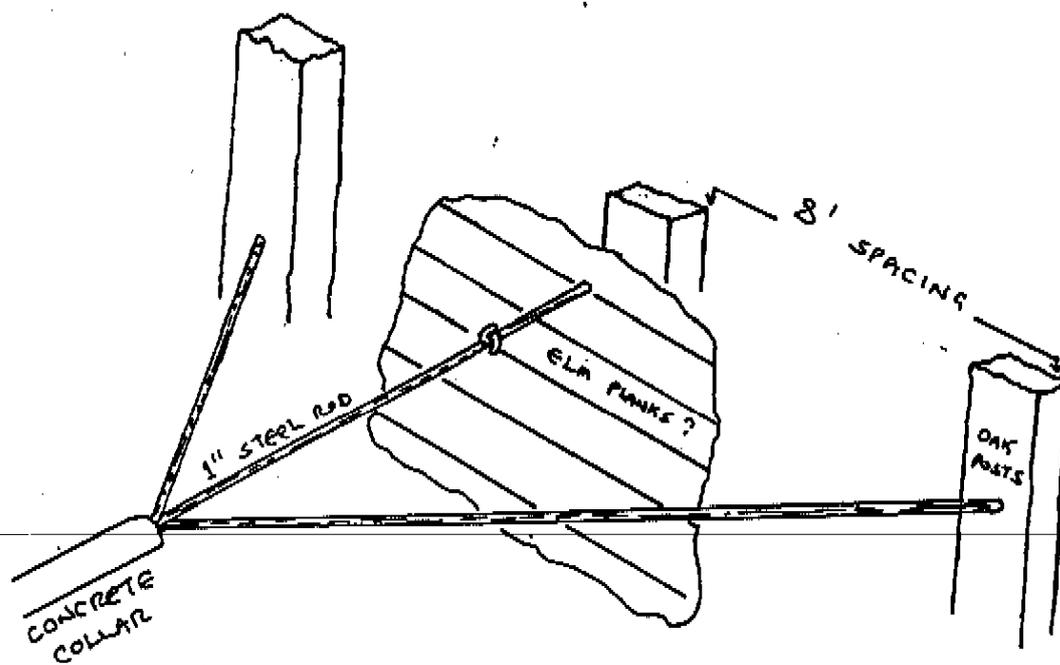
Eastern Approach Road Watching Brief. Area 2a revetment anchoring.
